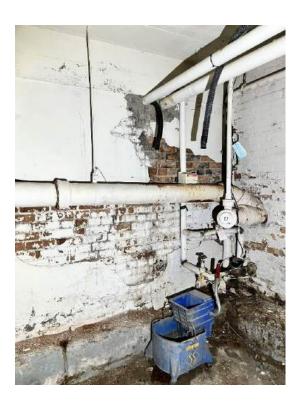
View of the foundation wall where moisture had caused the surface to fail
